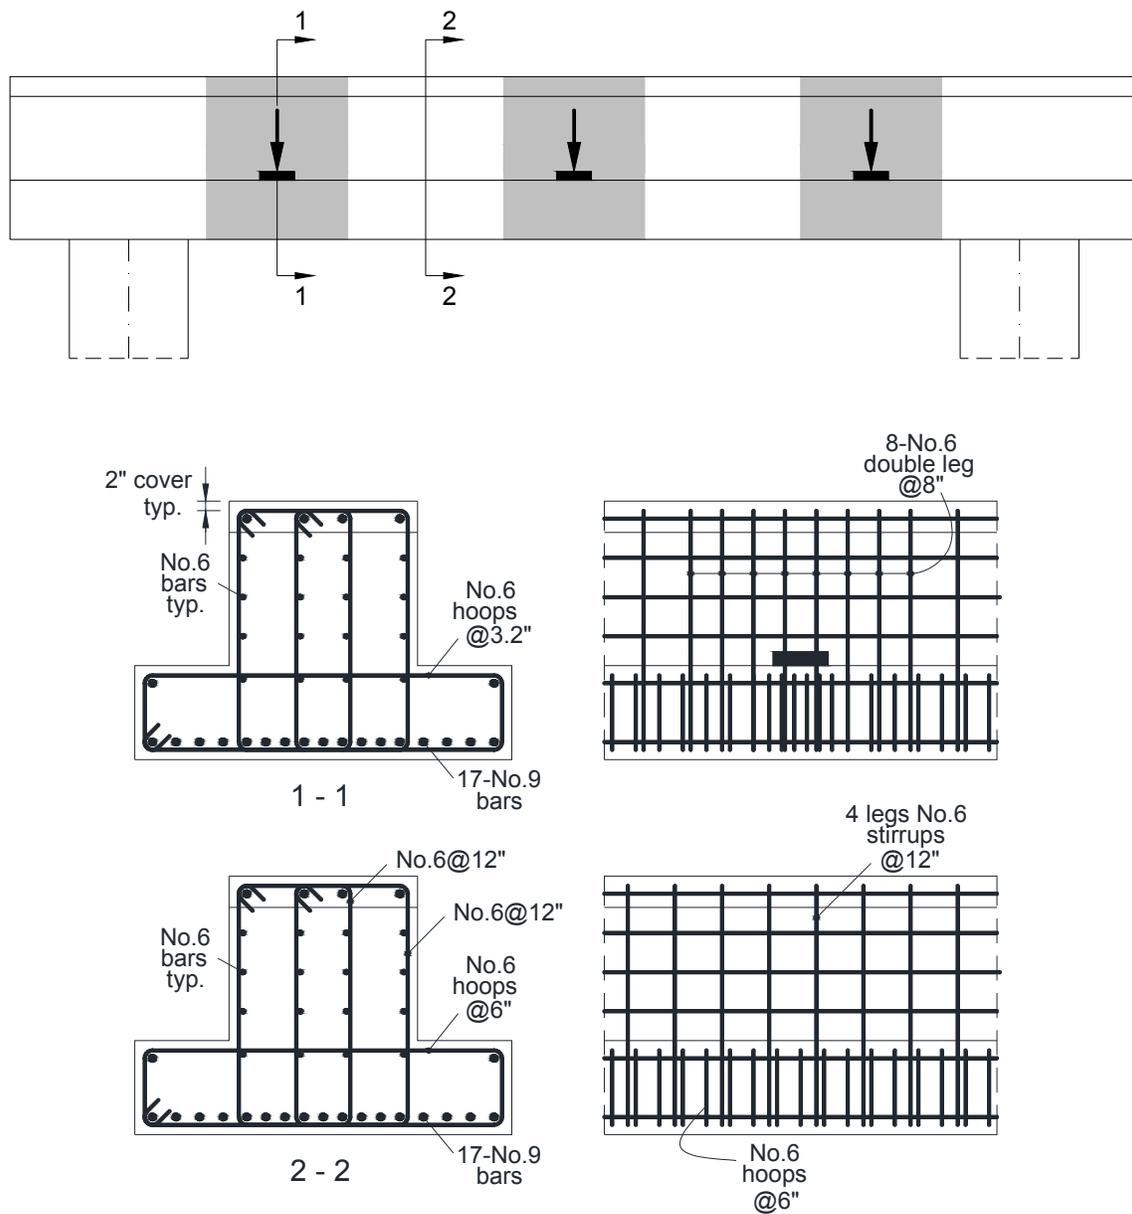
Reinforcement required to satisfy strength and crack control requirements.
